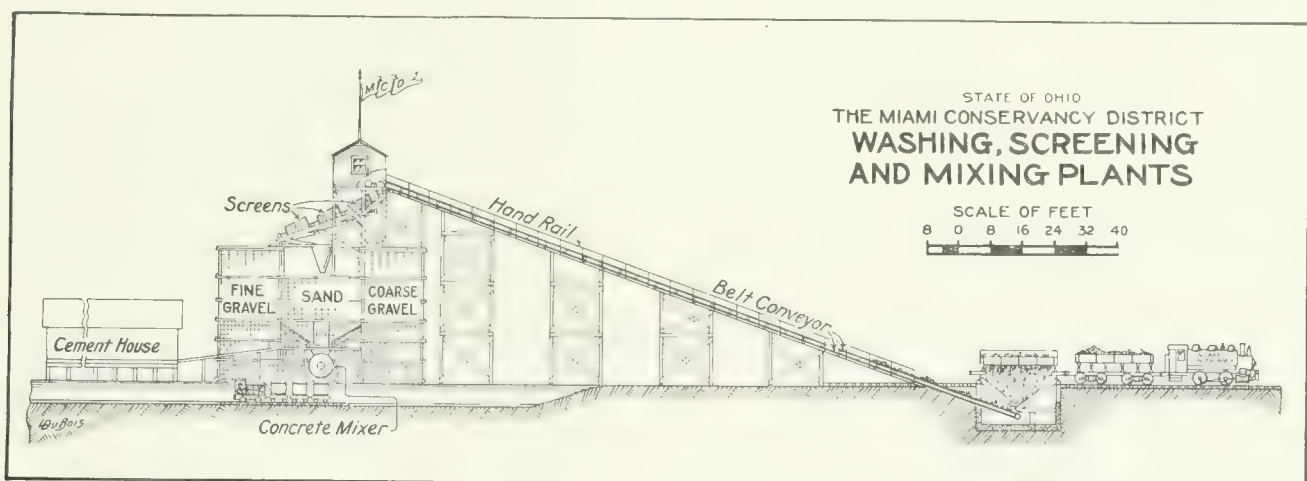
GRAVEL WASHING AND SCREENING PLANT.
